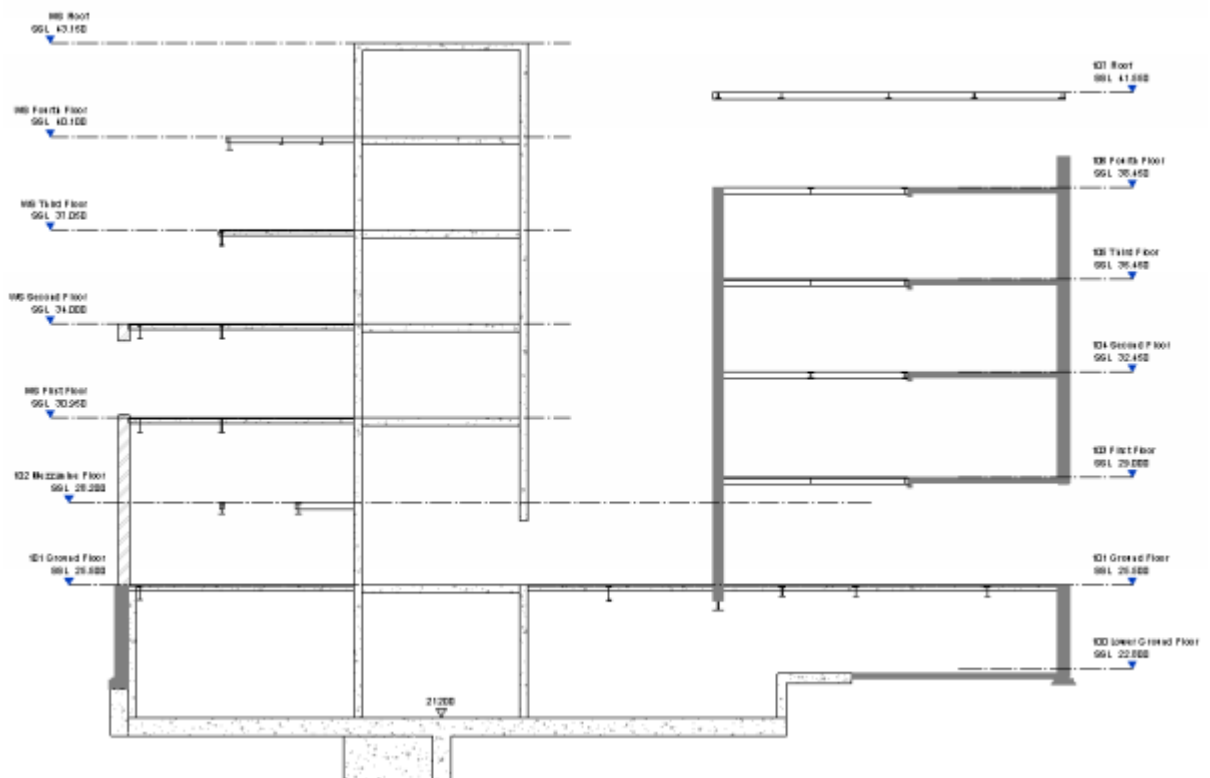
Proposed Section along New Oxford Street & West Central Street
